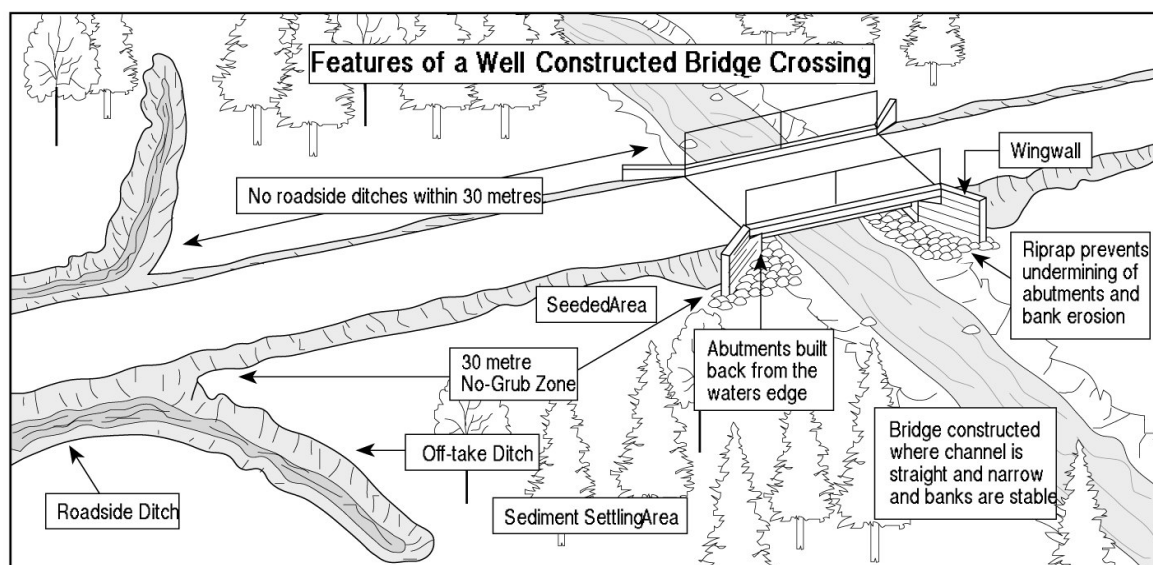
General features of a well constructed bridge crossing, including the 30 m no-grub zone.
